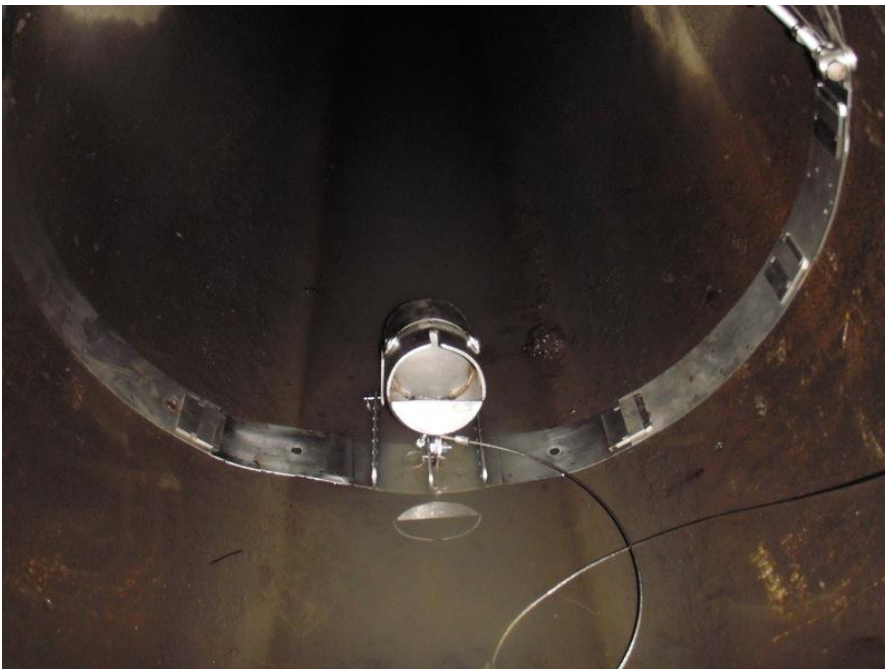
(December 22, 2010). Screened Inline Flow-Through (SIFT)© ¹ sediment trap installed in the 30-inch diameter outgoing line at manhole AAP953. SIFT trap is positioned 3 feet downstream of manhole.
